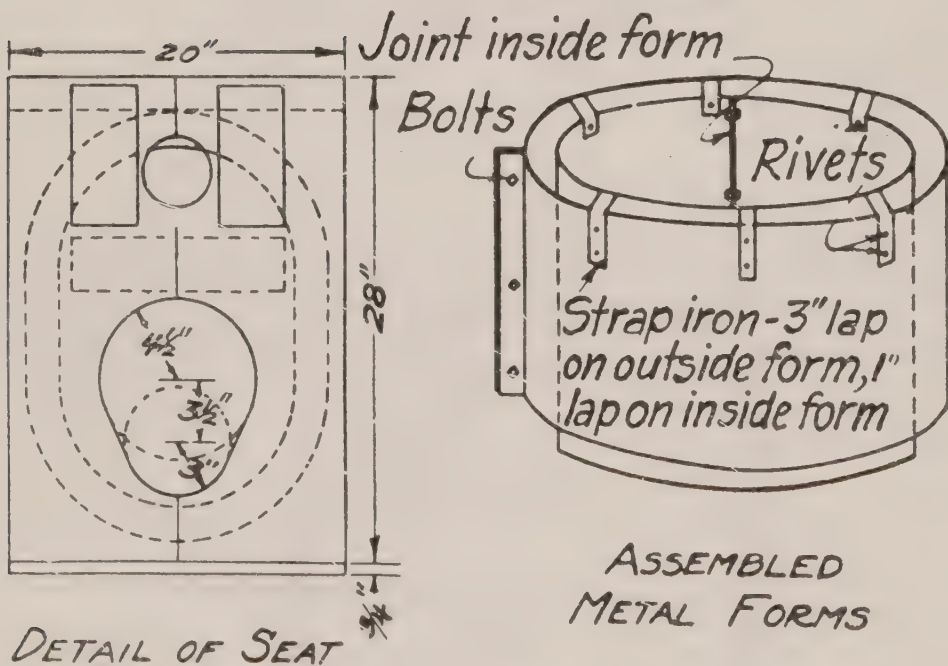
Suggested concrete-floor concrete-riser pit privy. (From Supplement No. 108, P. H. Reports.)—Continued.
